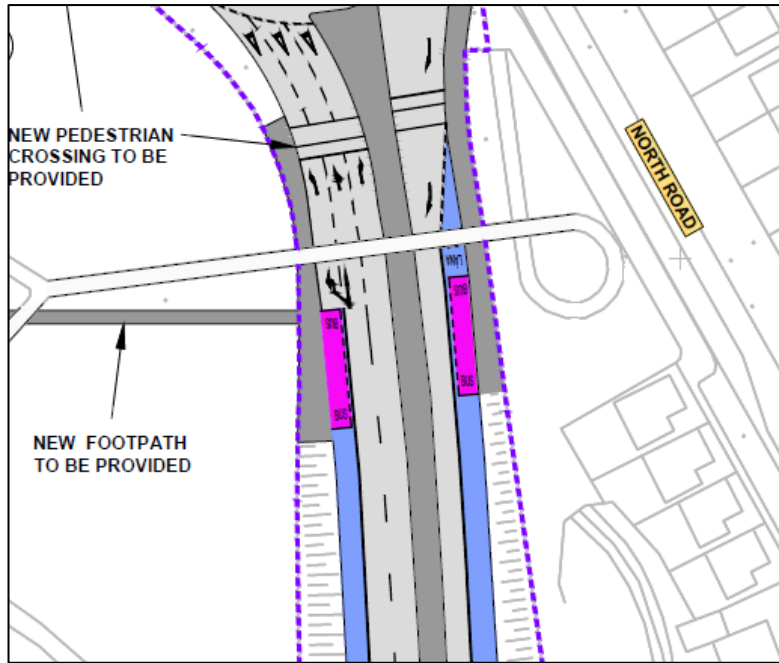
EPR Option A on Finglas Road North Plan - Plan
